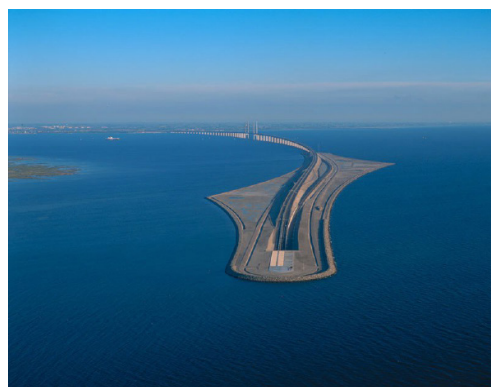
Øresund Bridge, an example of modern tunnel which connects Sweden to Denmark
